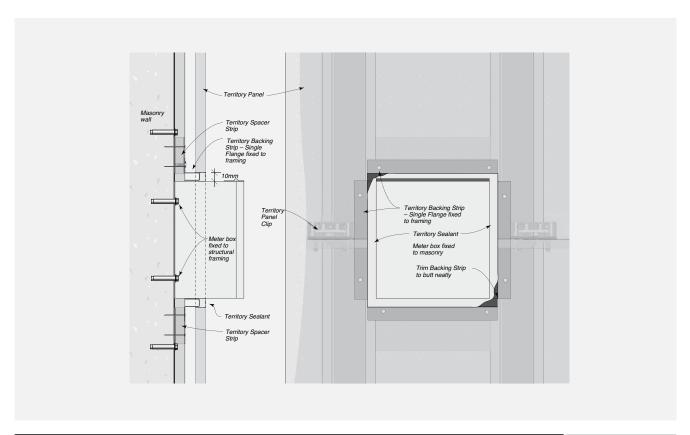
Typical Power/Meter Box – Mounted to Face of Framing
